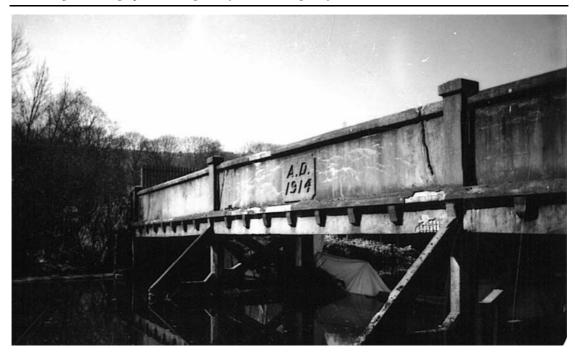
South-facing view showing parapet and parapet sill (10) over cross beams (8) with vertical pillars (9a-9c) and date stone (13) (MF SB06_15)
